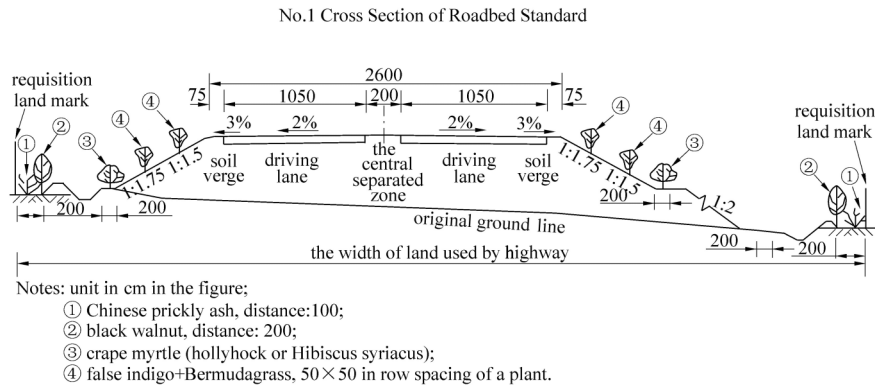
Cross section of biological protection design on the side slope of No. 1 roadbed in Luoyang section
